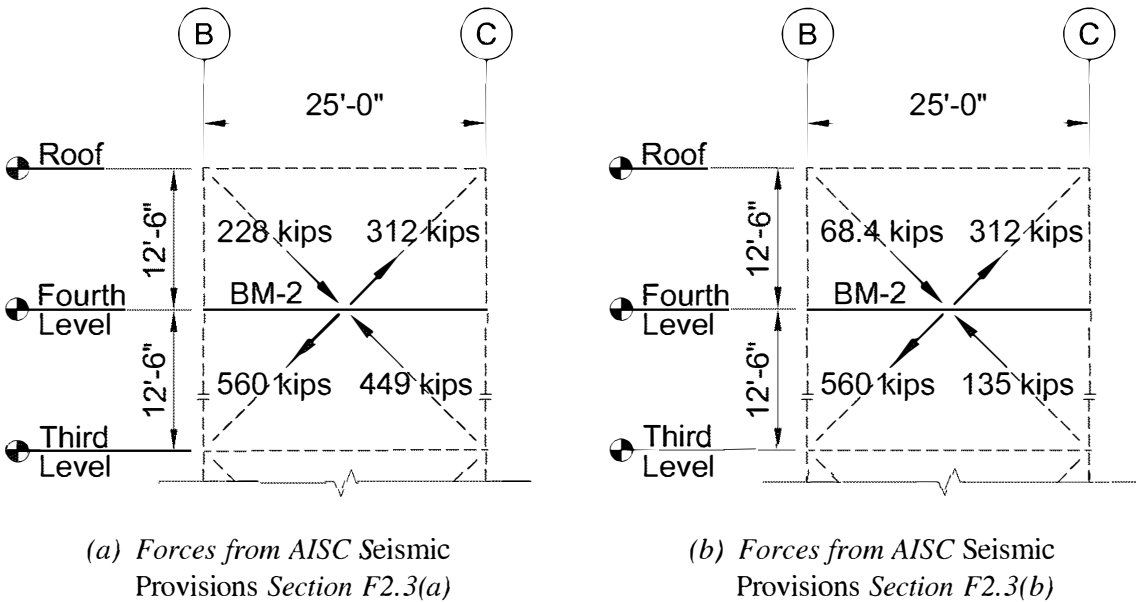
Forces acting on Beam BM-2 from a mechanism analysis of AISC Seismic Provisions Section F2.3 as carried out in Example 5.3.2.
